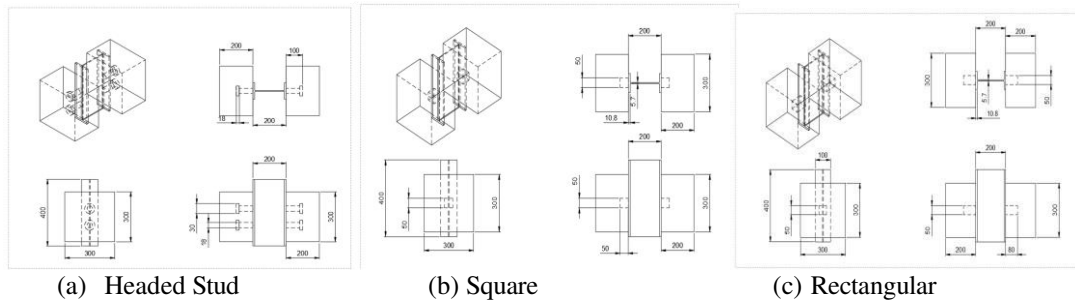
Line sketch of Push-out specimens with shear connectors (All dimensions are in mm)
